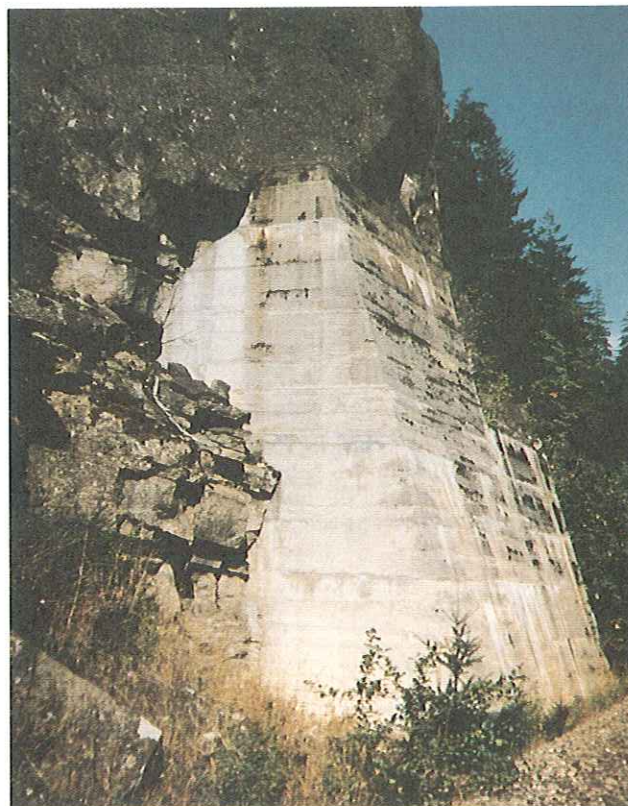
Large concrete buttress supporting very large overhanging rock. This will provide long-term stability.
